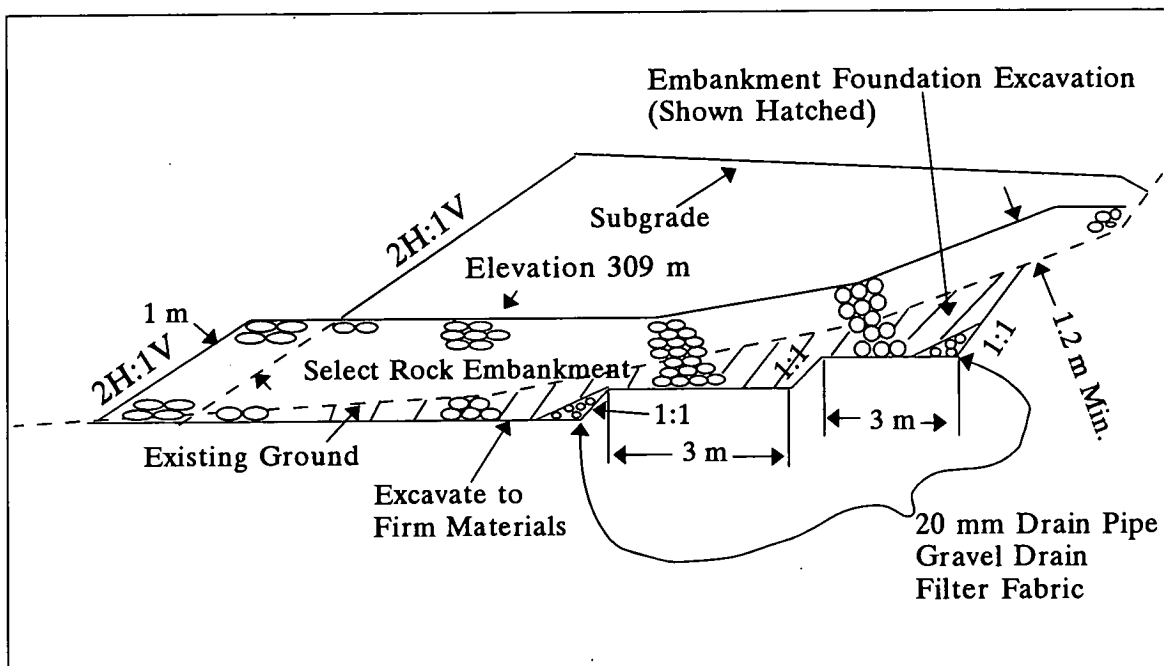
Oregon benching and drainage detail (modified from Machan et al. 1989).
